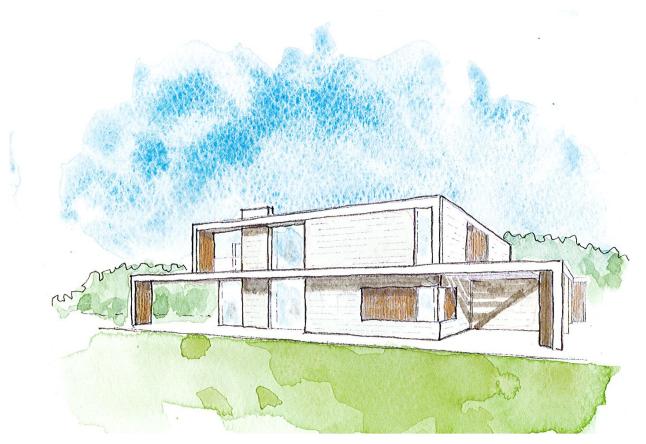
NEW FARM HOUSE SOUTH ELEVATION
